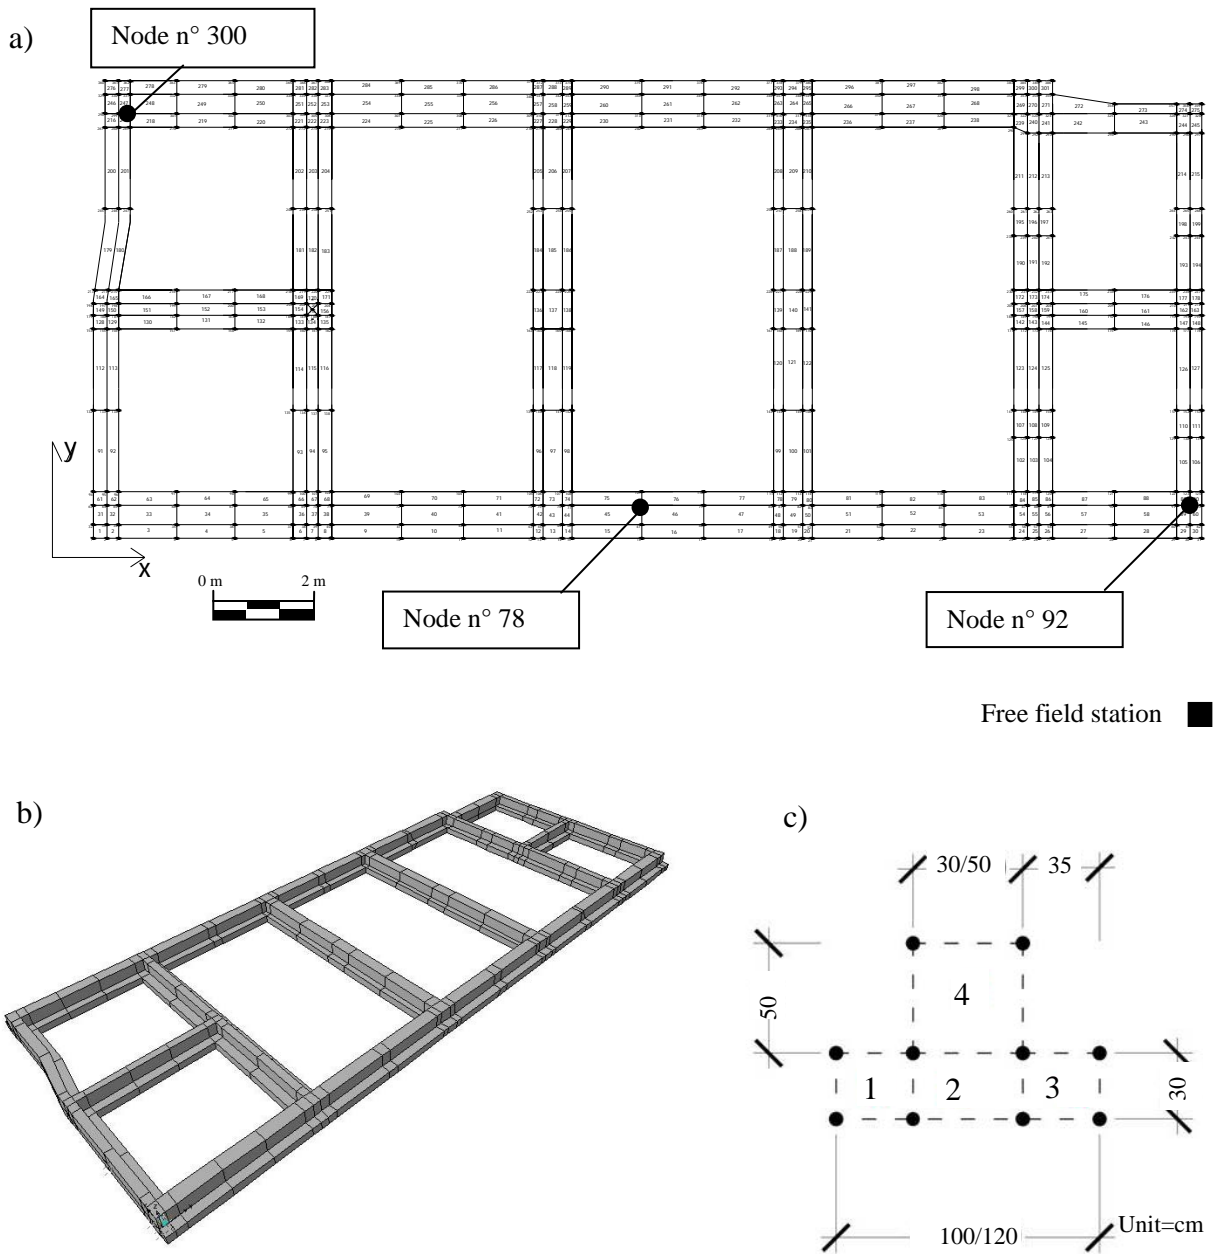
Planar section (a), 3-D view (b) and type-section (c) of the input foundation model (after Palermo, 2005)
